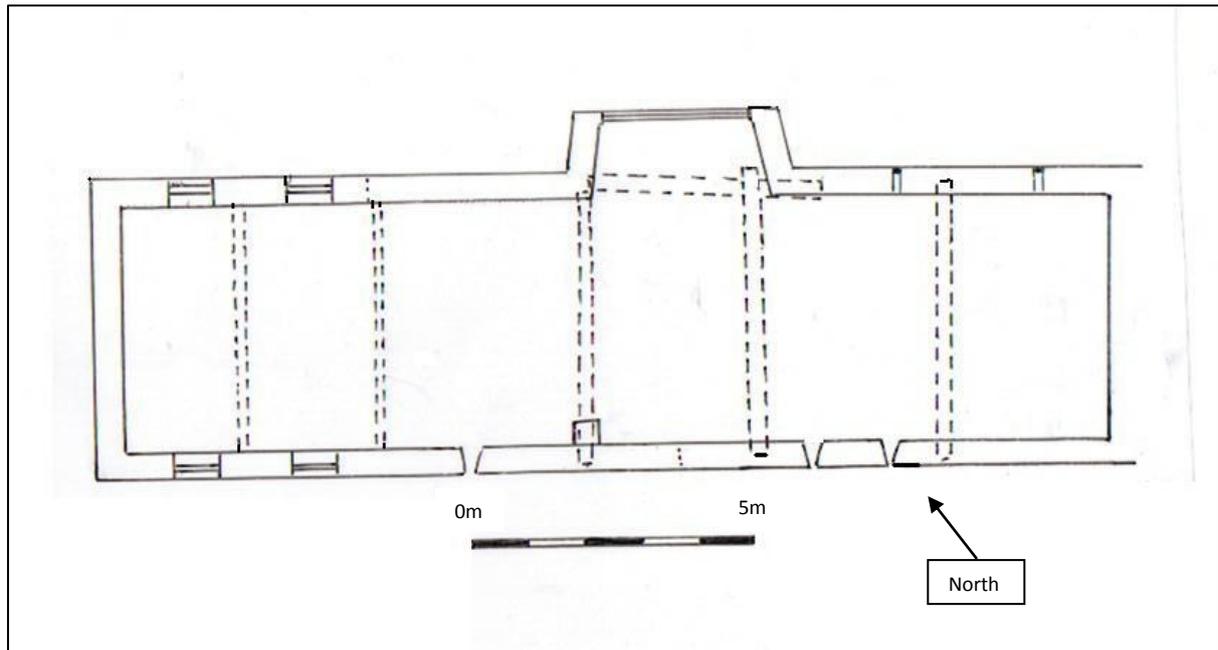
Upper floor plan of Barn showing arrangement of roof trusses
